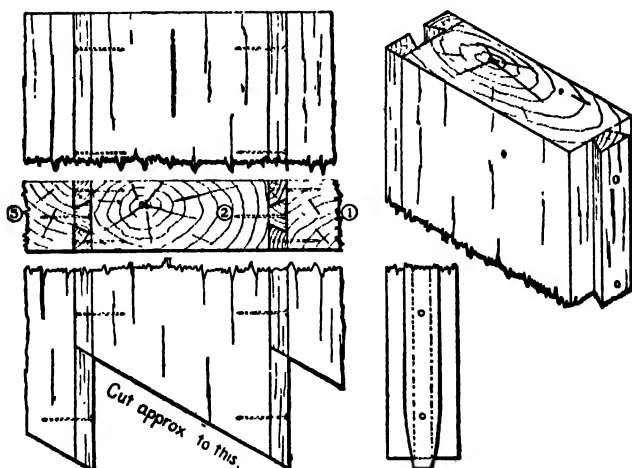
Details of Timber Sheet-Piling with Dovetail Joints.
